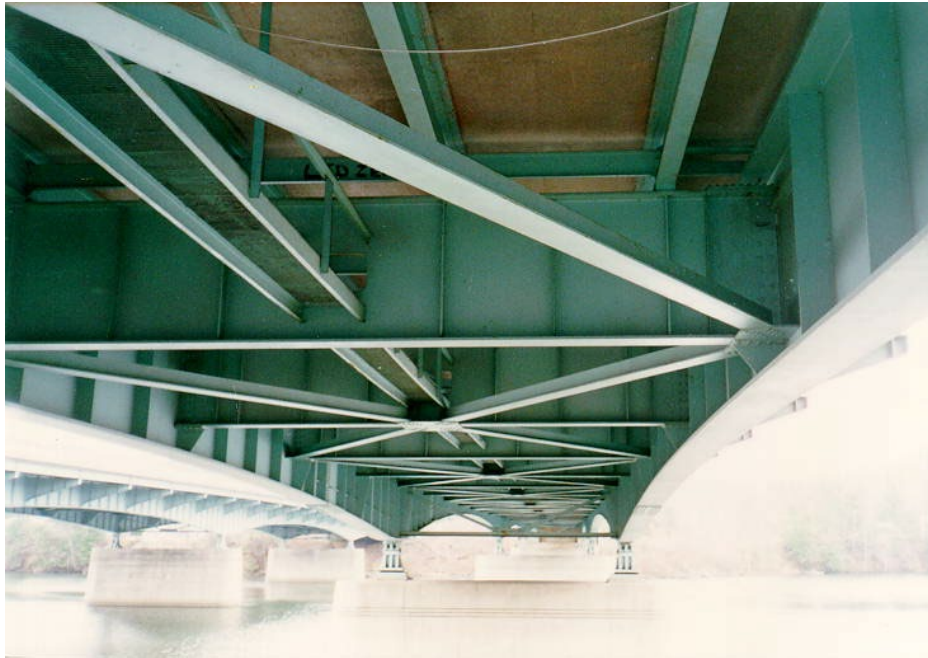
Typical Framing on a Girder-Floorbeam-Stringer Superstructure.
